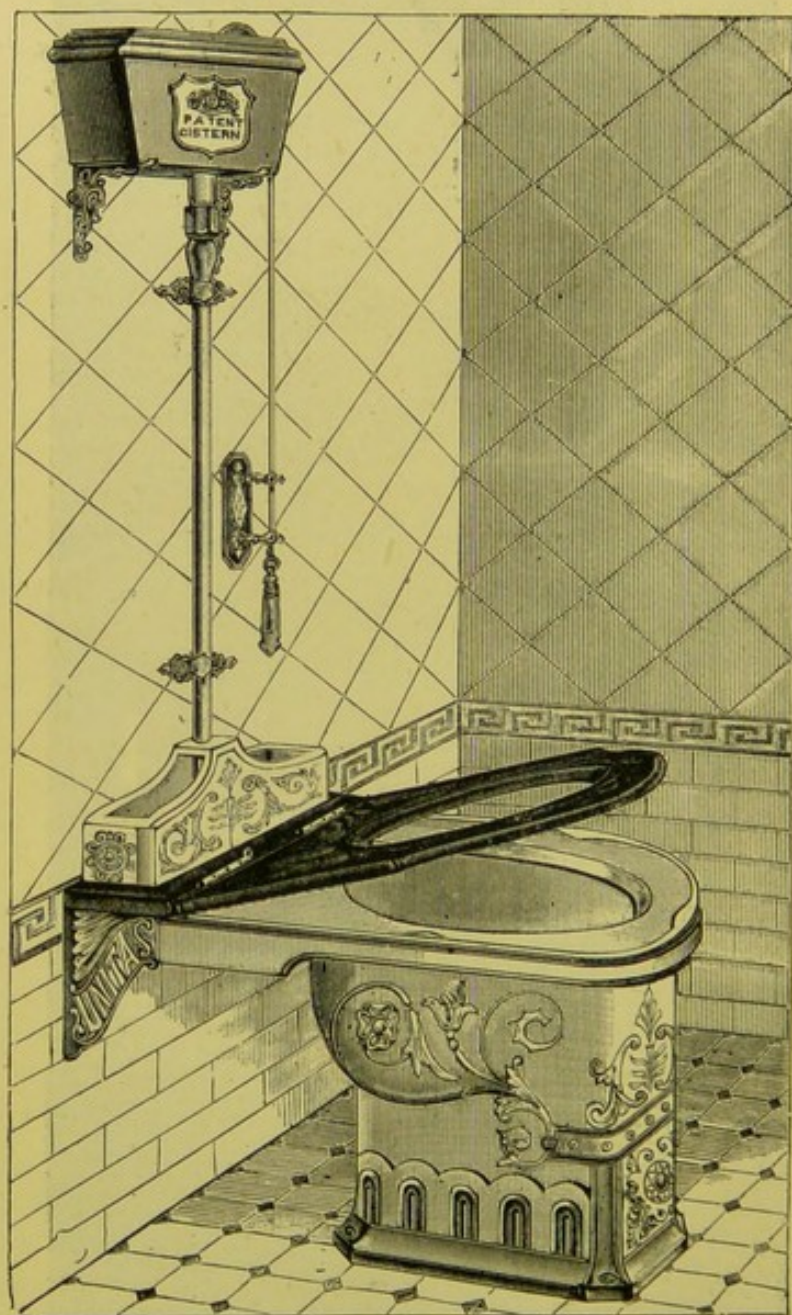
SIDE VIEW OF WASH-OUT CLOSET, SHOWING MOVABLE SEAT AND FLUSHING ARRANGEMENTS.
